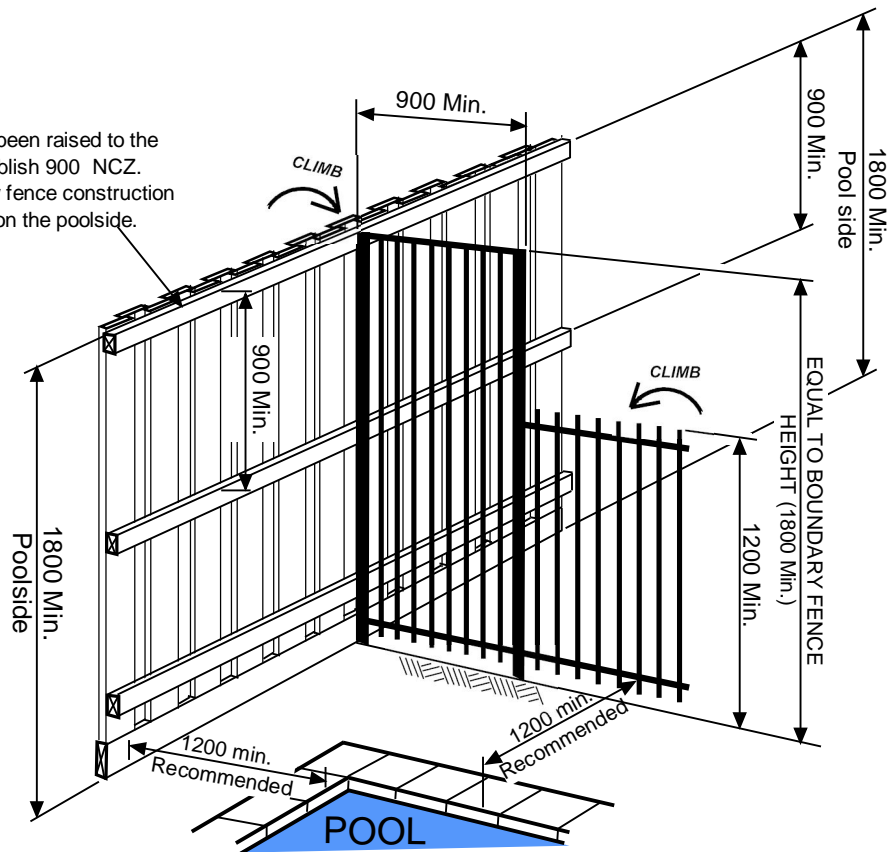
ALTERNATIVE BOUNDARY FENCE INTERSECTING A TYPICAL POOL BARRIER
